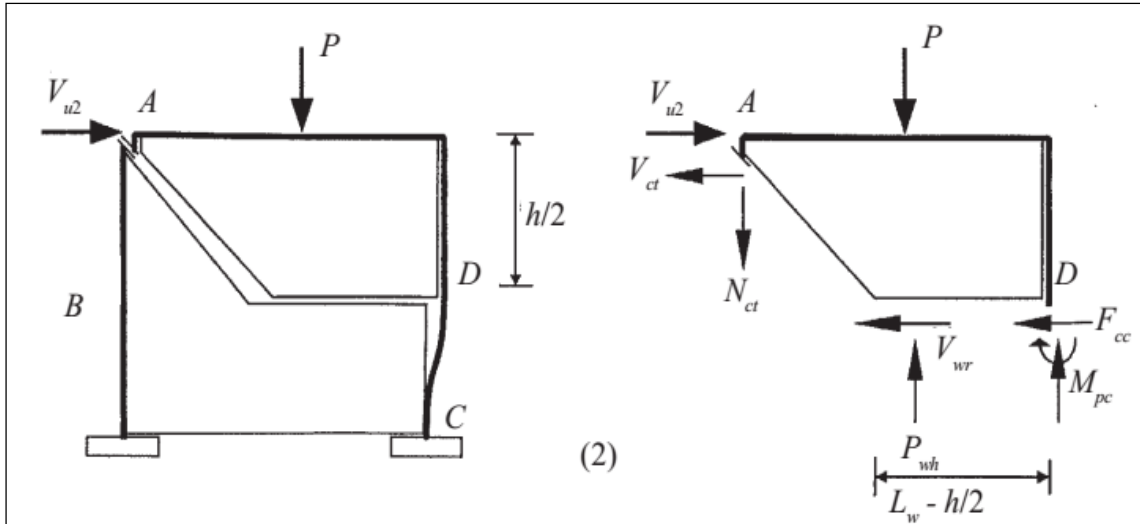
Failure mechanism 2 (Mehrabi & Shing, *Seismic Analysis of Masonry-Infilled Reinforced Concrete Frames*, 2003)
